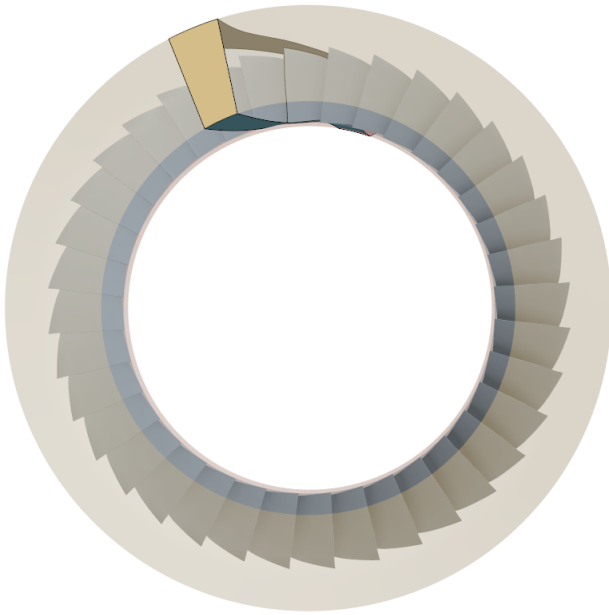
Front view of the ROTOR 37 CAD model
